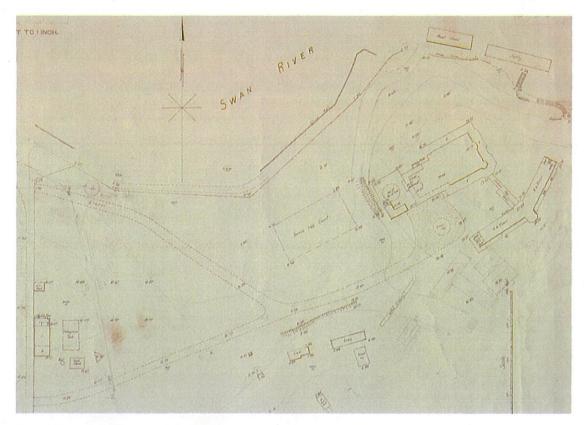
Metropolitan Sewer Plan 1937. SROWA_series634_cons4156_item1183
